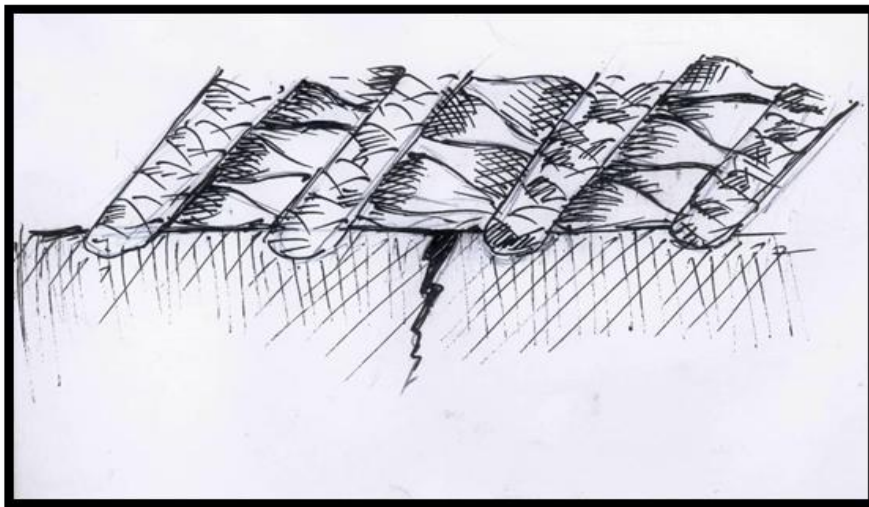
Represents the roof being affected by the cracking of the walls.
